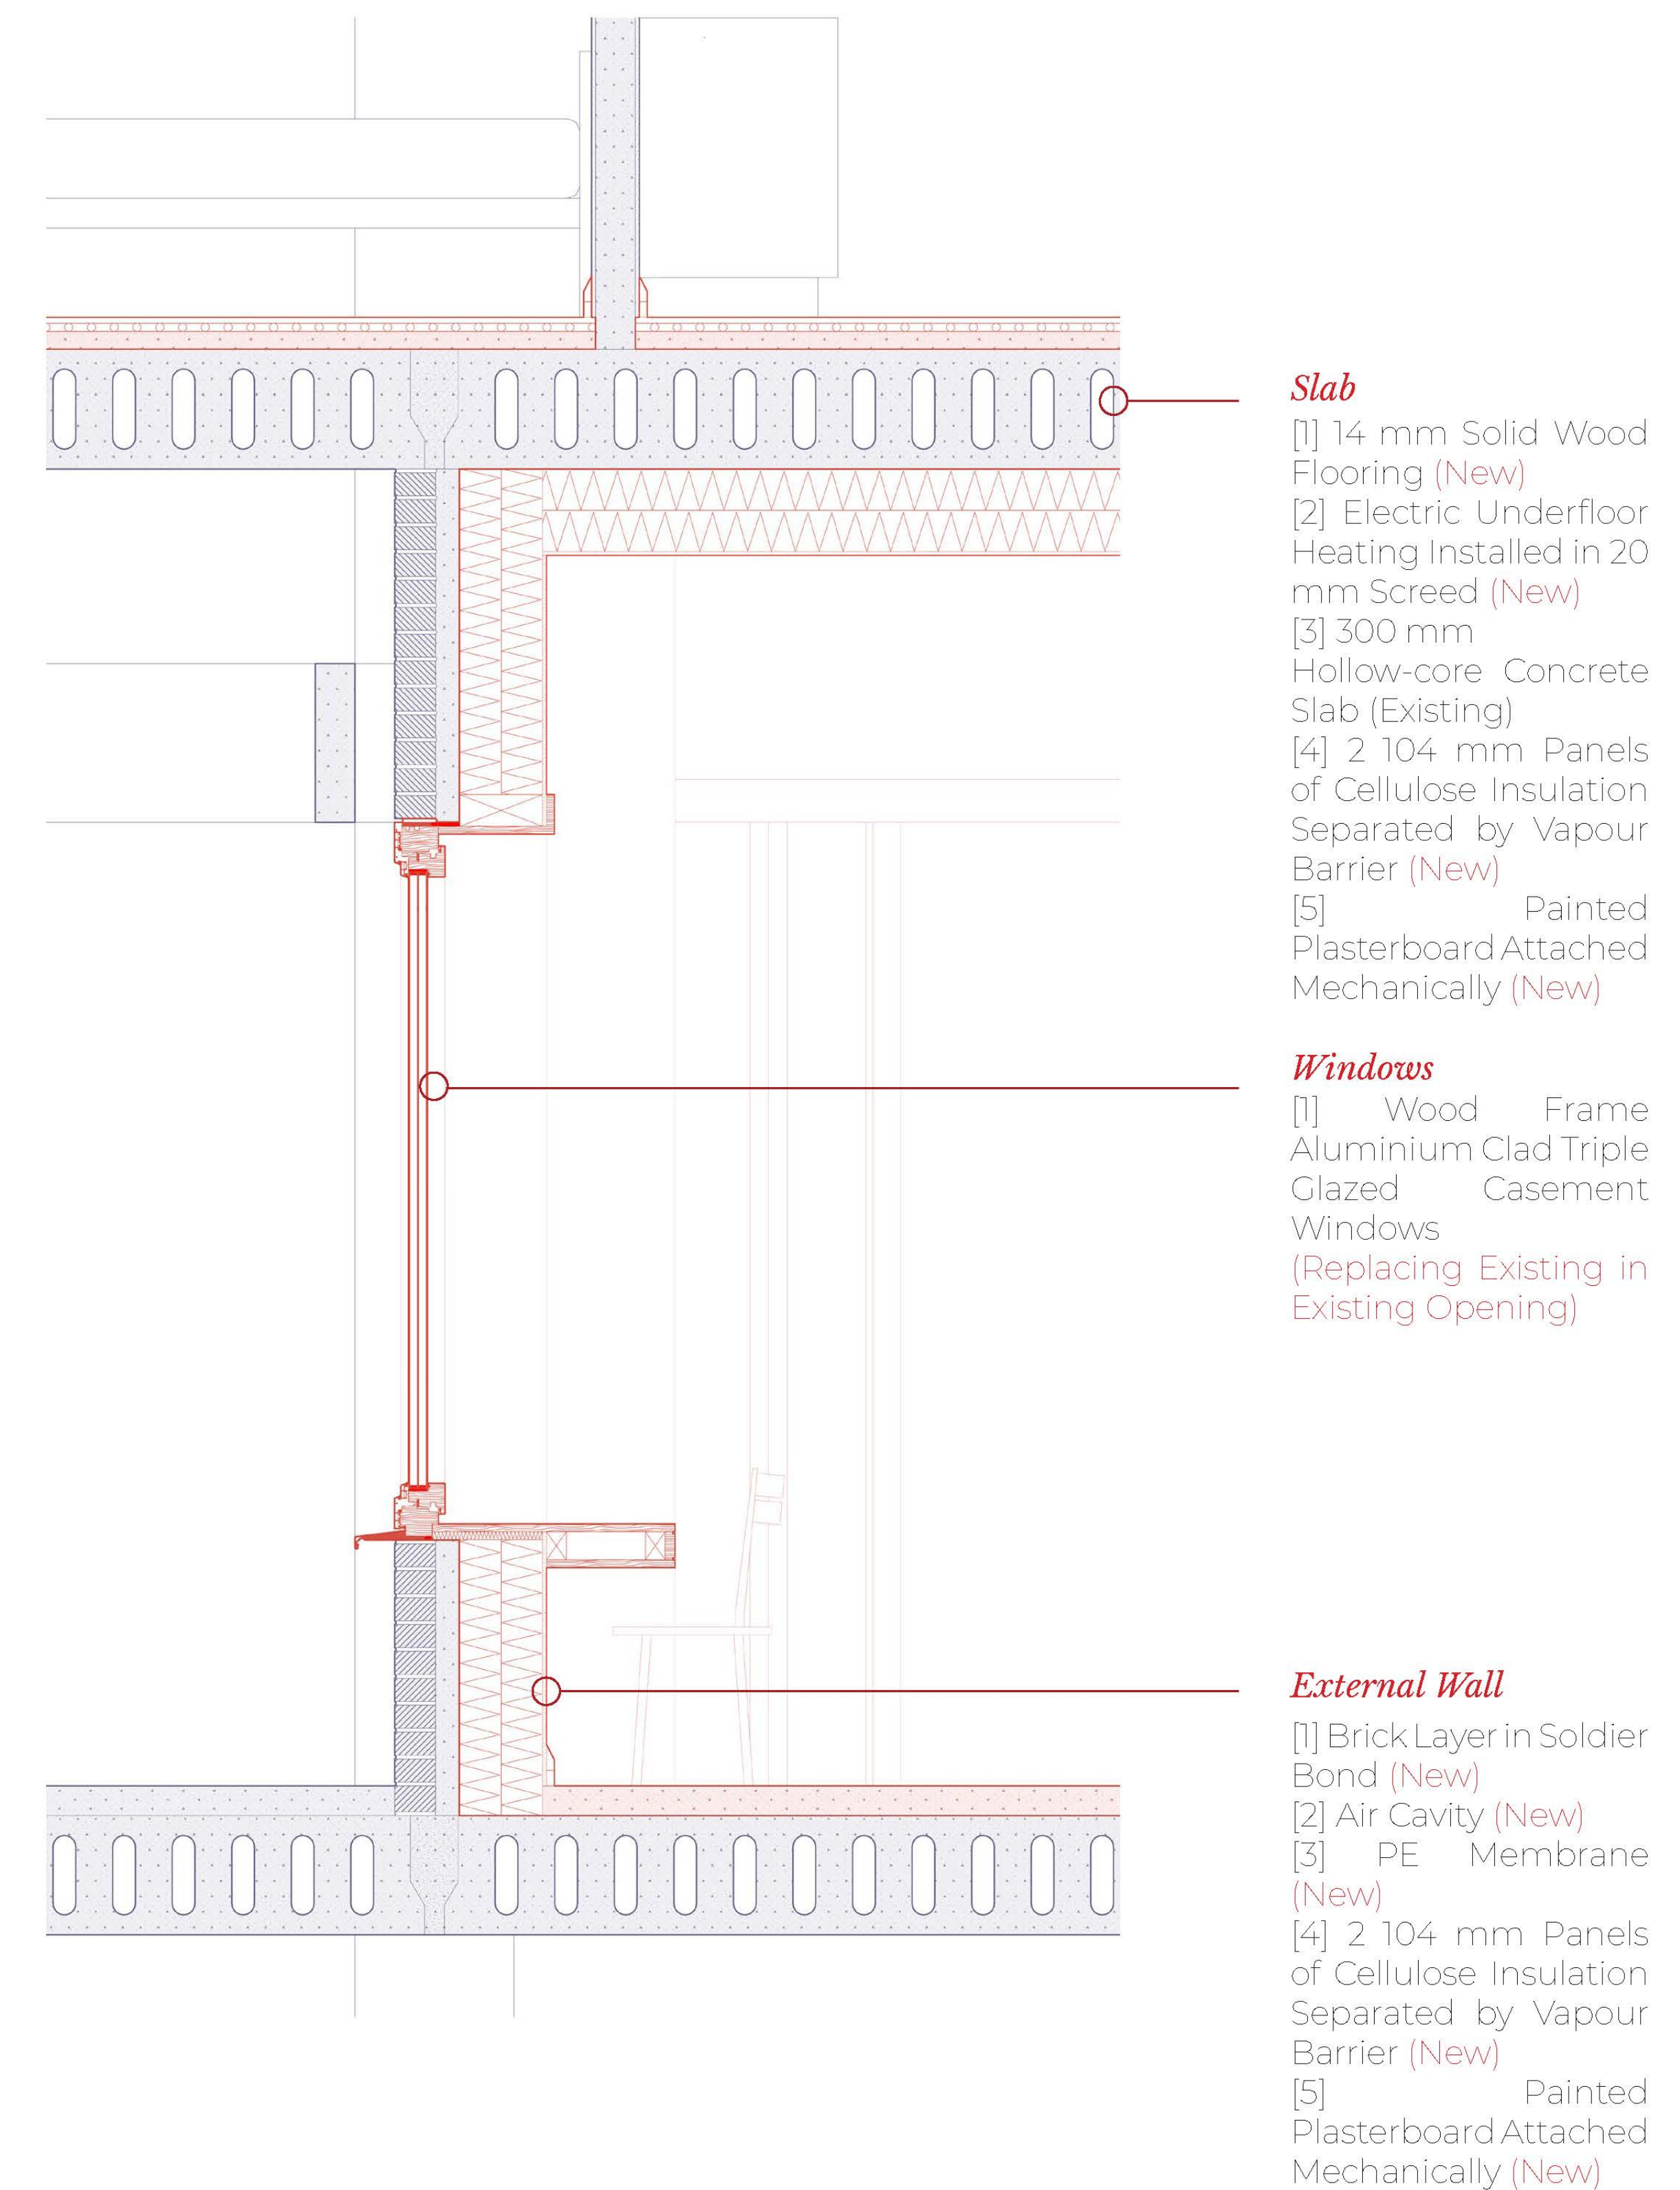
(Up) Insulating Existing Ground Floor Spaces.
